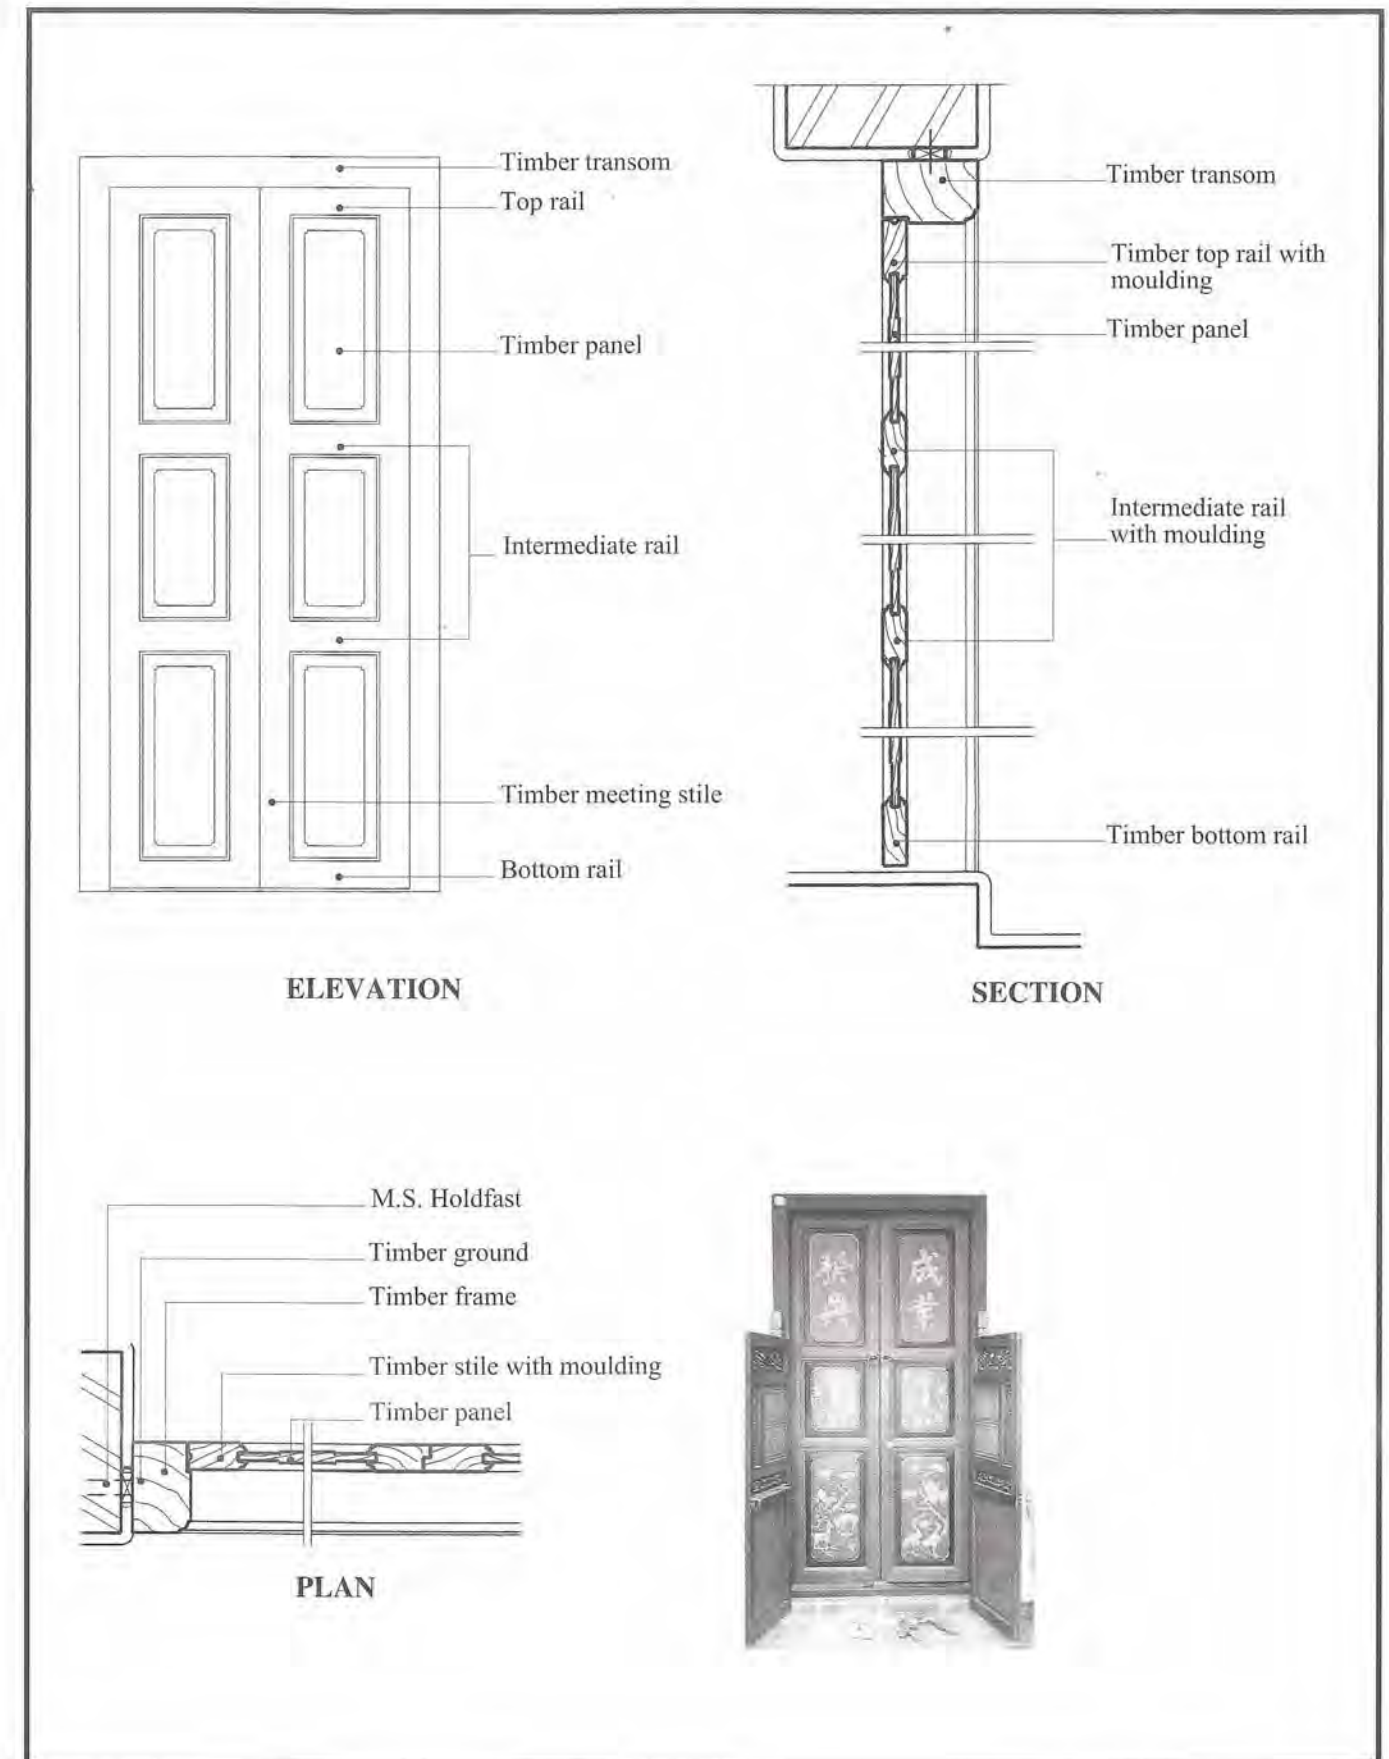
Elevation, Section and Plan of a typical French window detail and an example of the restored element.
